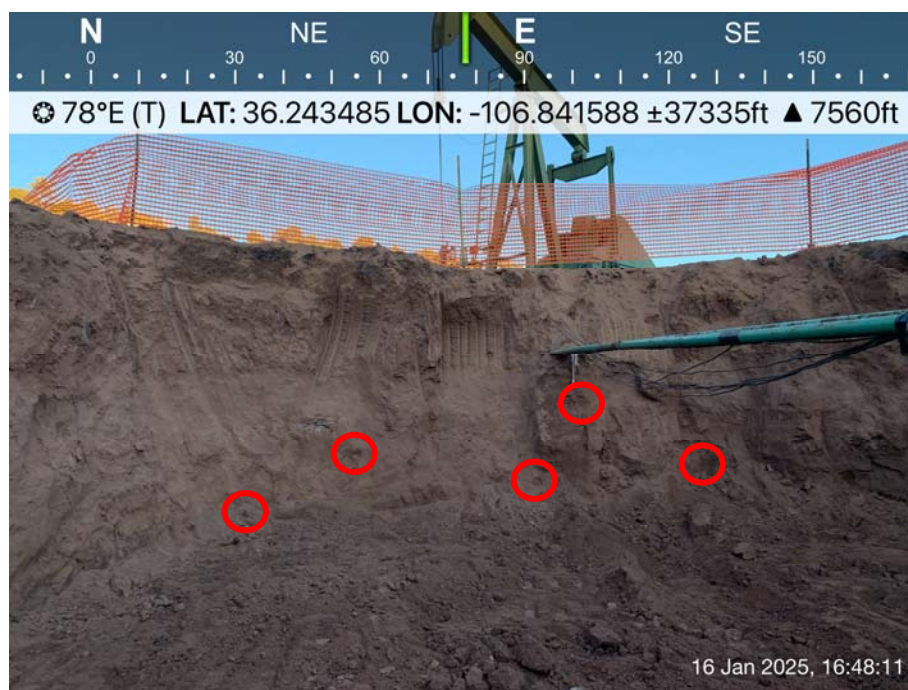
SS04 collected as a five-point composite sample 4-10 ft bgs from east sidewall of excavation.
